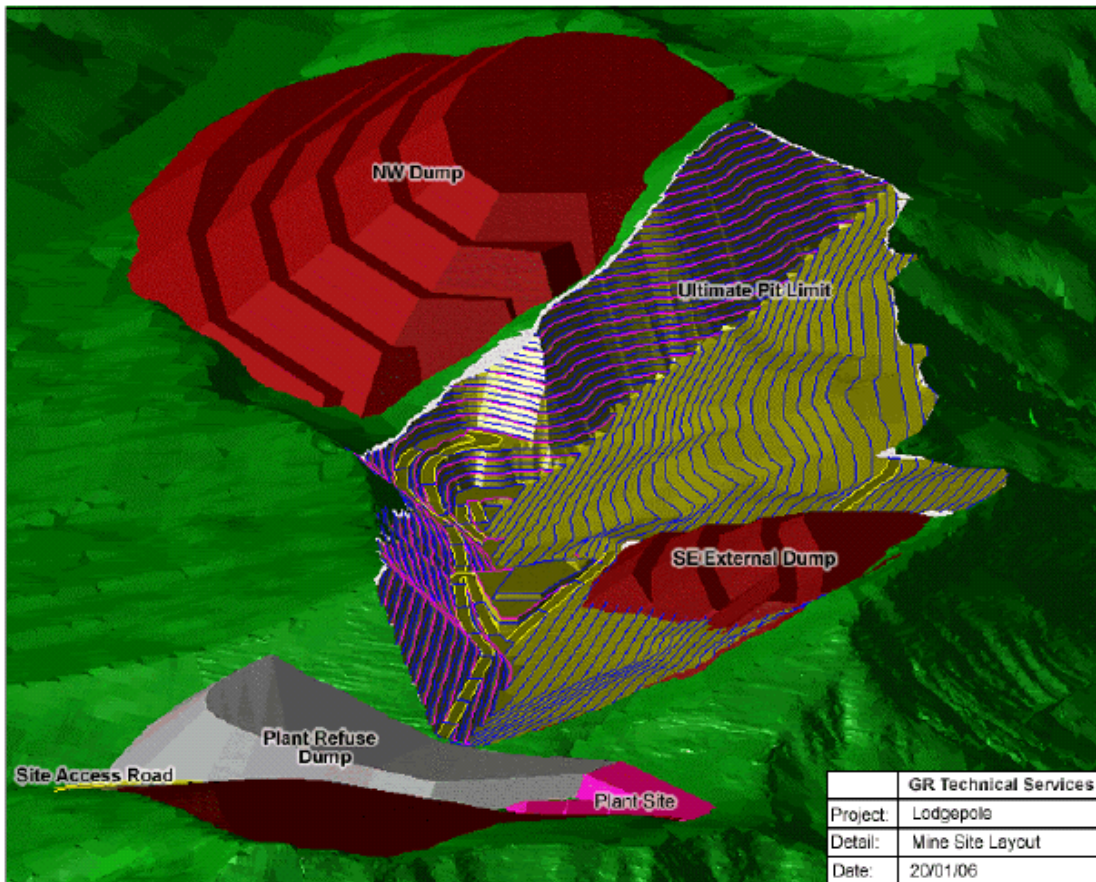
Proposed mine site layout of the Lodgepole open-pit coal mine.
